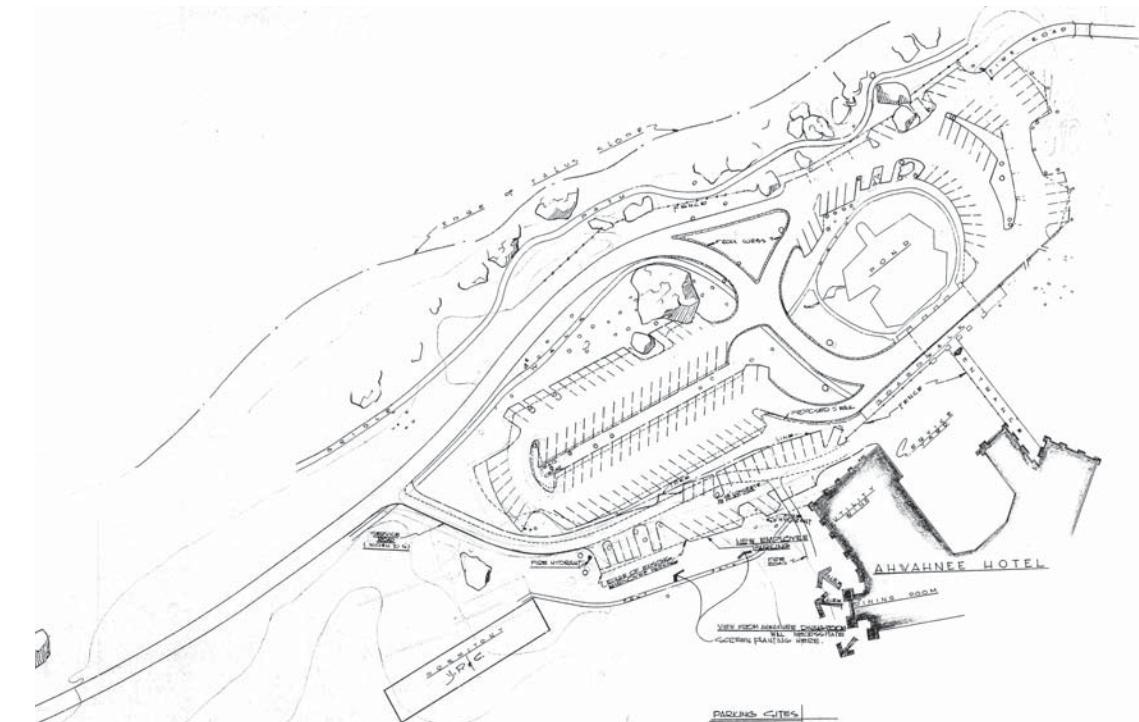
Plan of the proposed parking space additions, 1965. (Source: Knowles and Savage, "Parking Area, Ahwahnee Hotel," Drawing No. NP-YO, NPS Denver Service Center Archives.)
